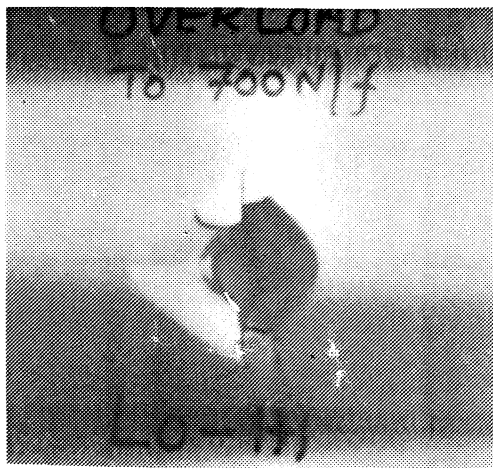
Cracks Observed during RBL Tests on Corrugated Roofing
